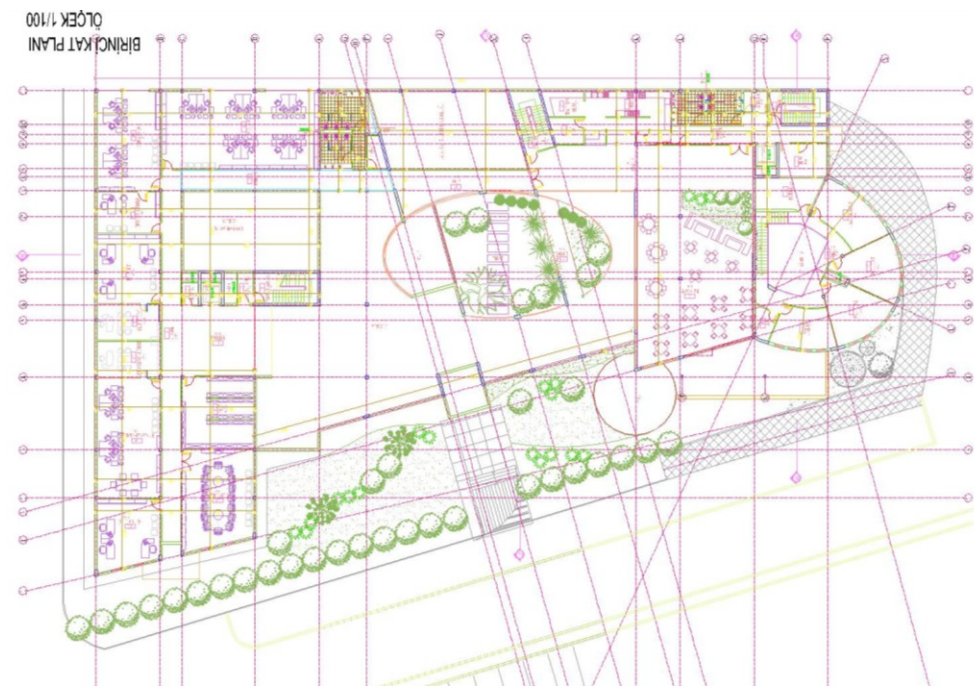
Office block, 1st floor plan (First design, before BREEAM)
